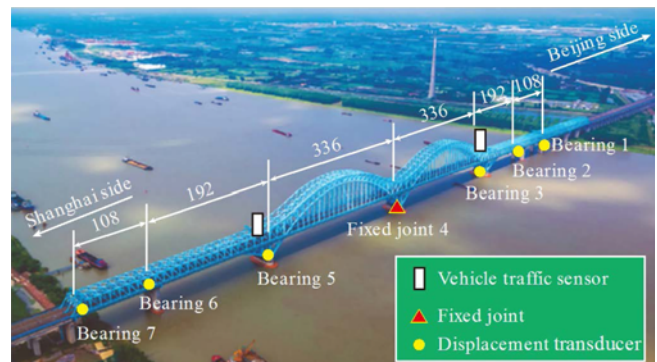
The Layout of Sensors on Continuous Truss Bridge (unit: m)
